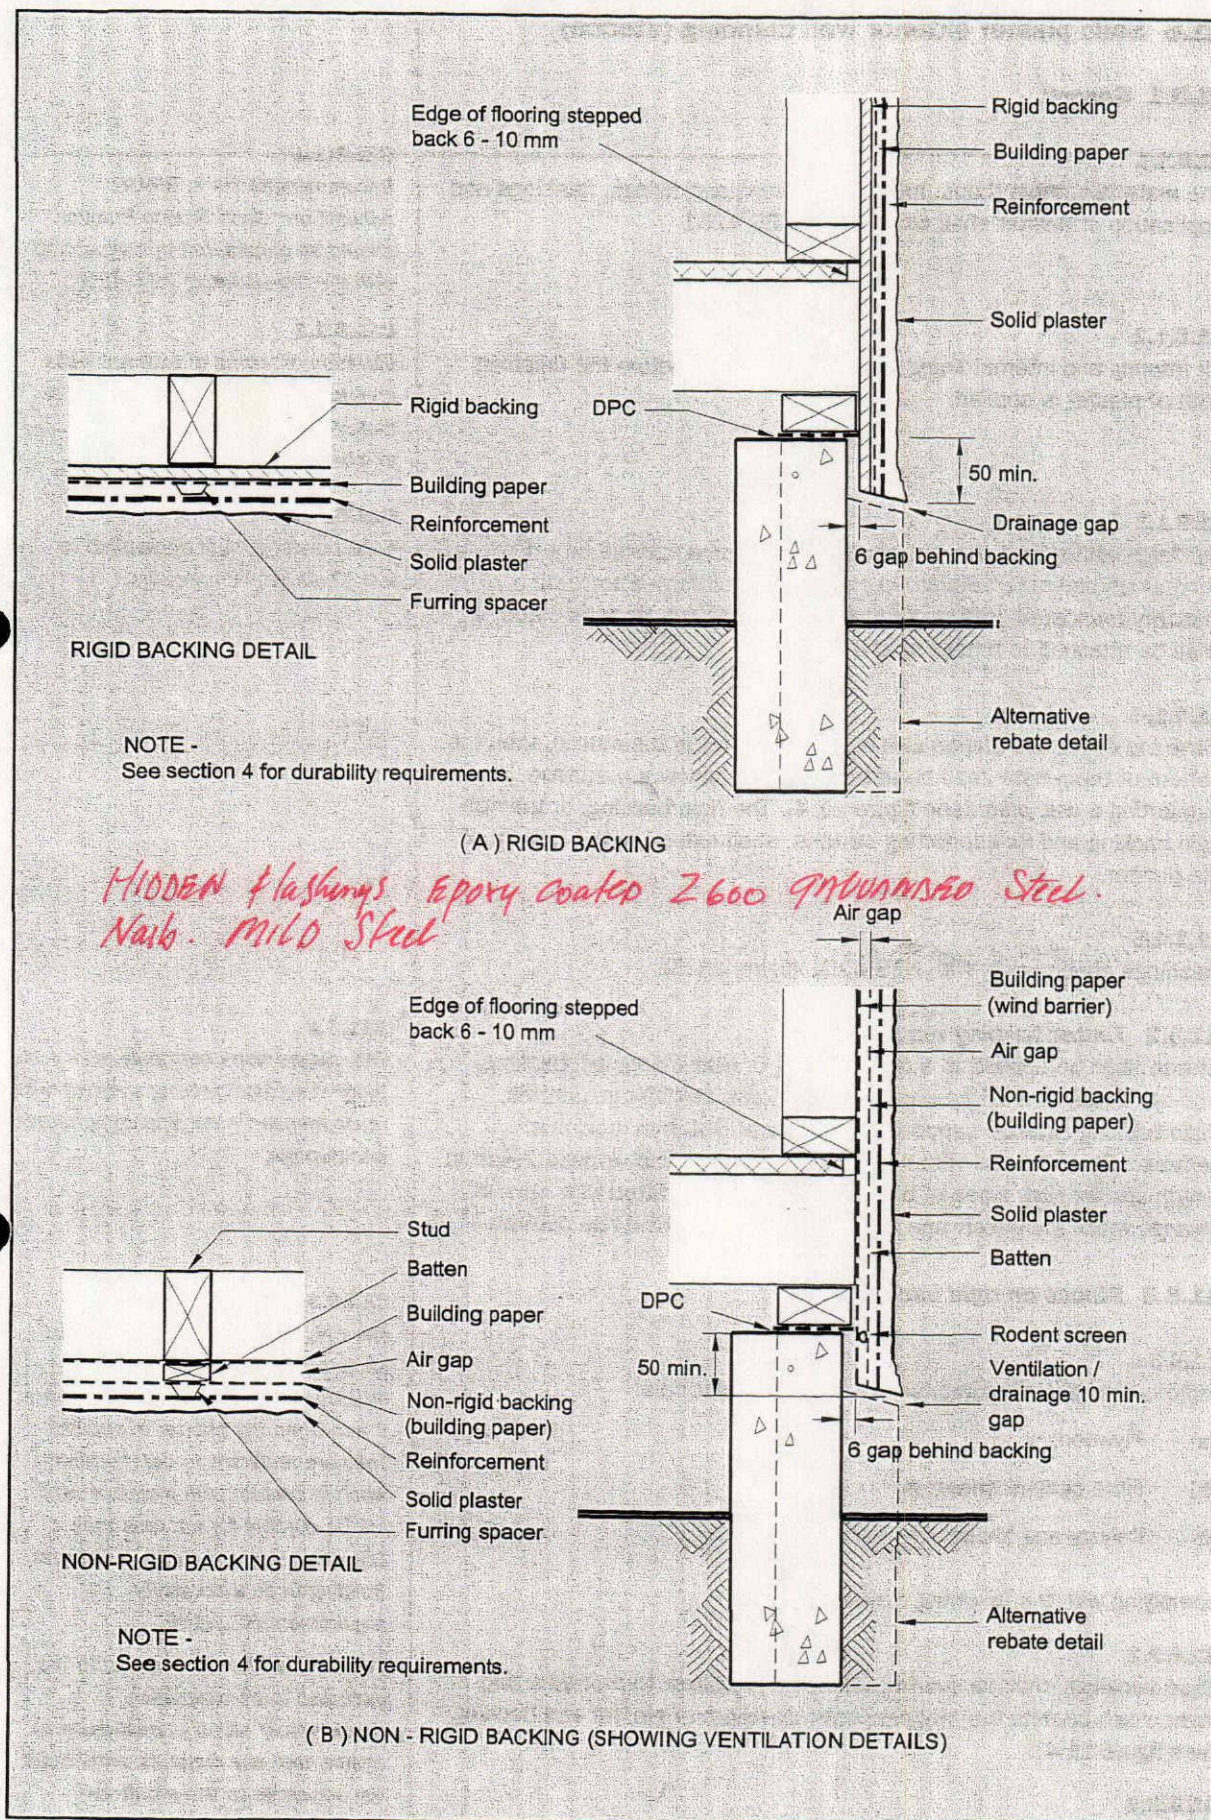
Backing details (see 11.8.1.4 and 11.8.3.2)
